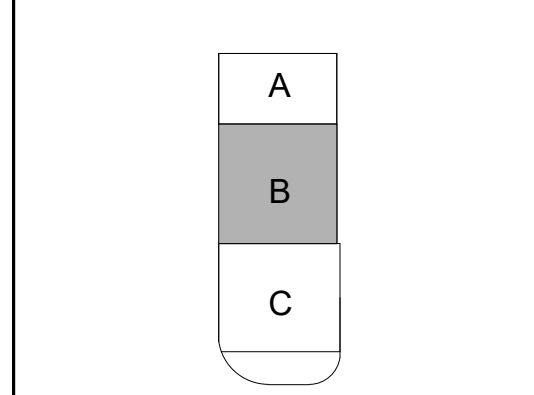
DETAILED PIPE RACK & SUPPORT LAYOUT AREA B
